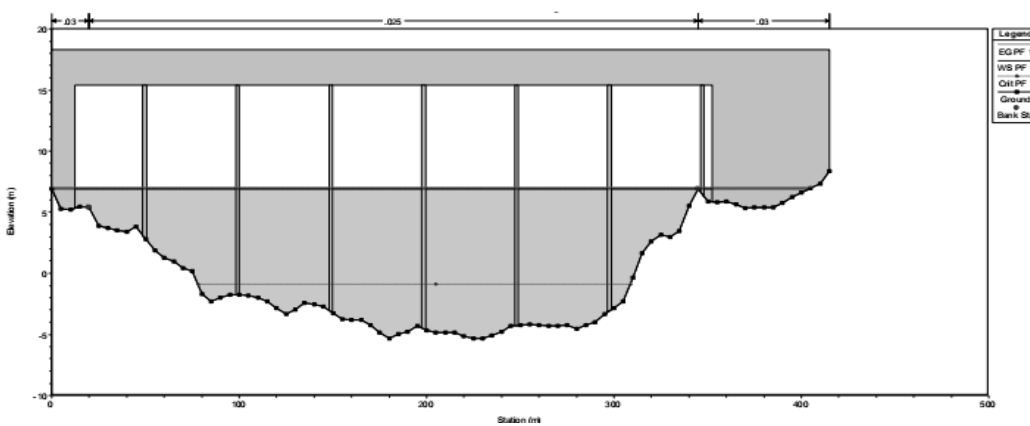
Cross section showing the flood-level the bridge site for design discharge.
